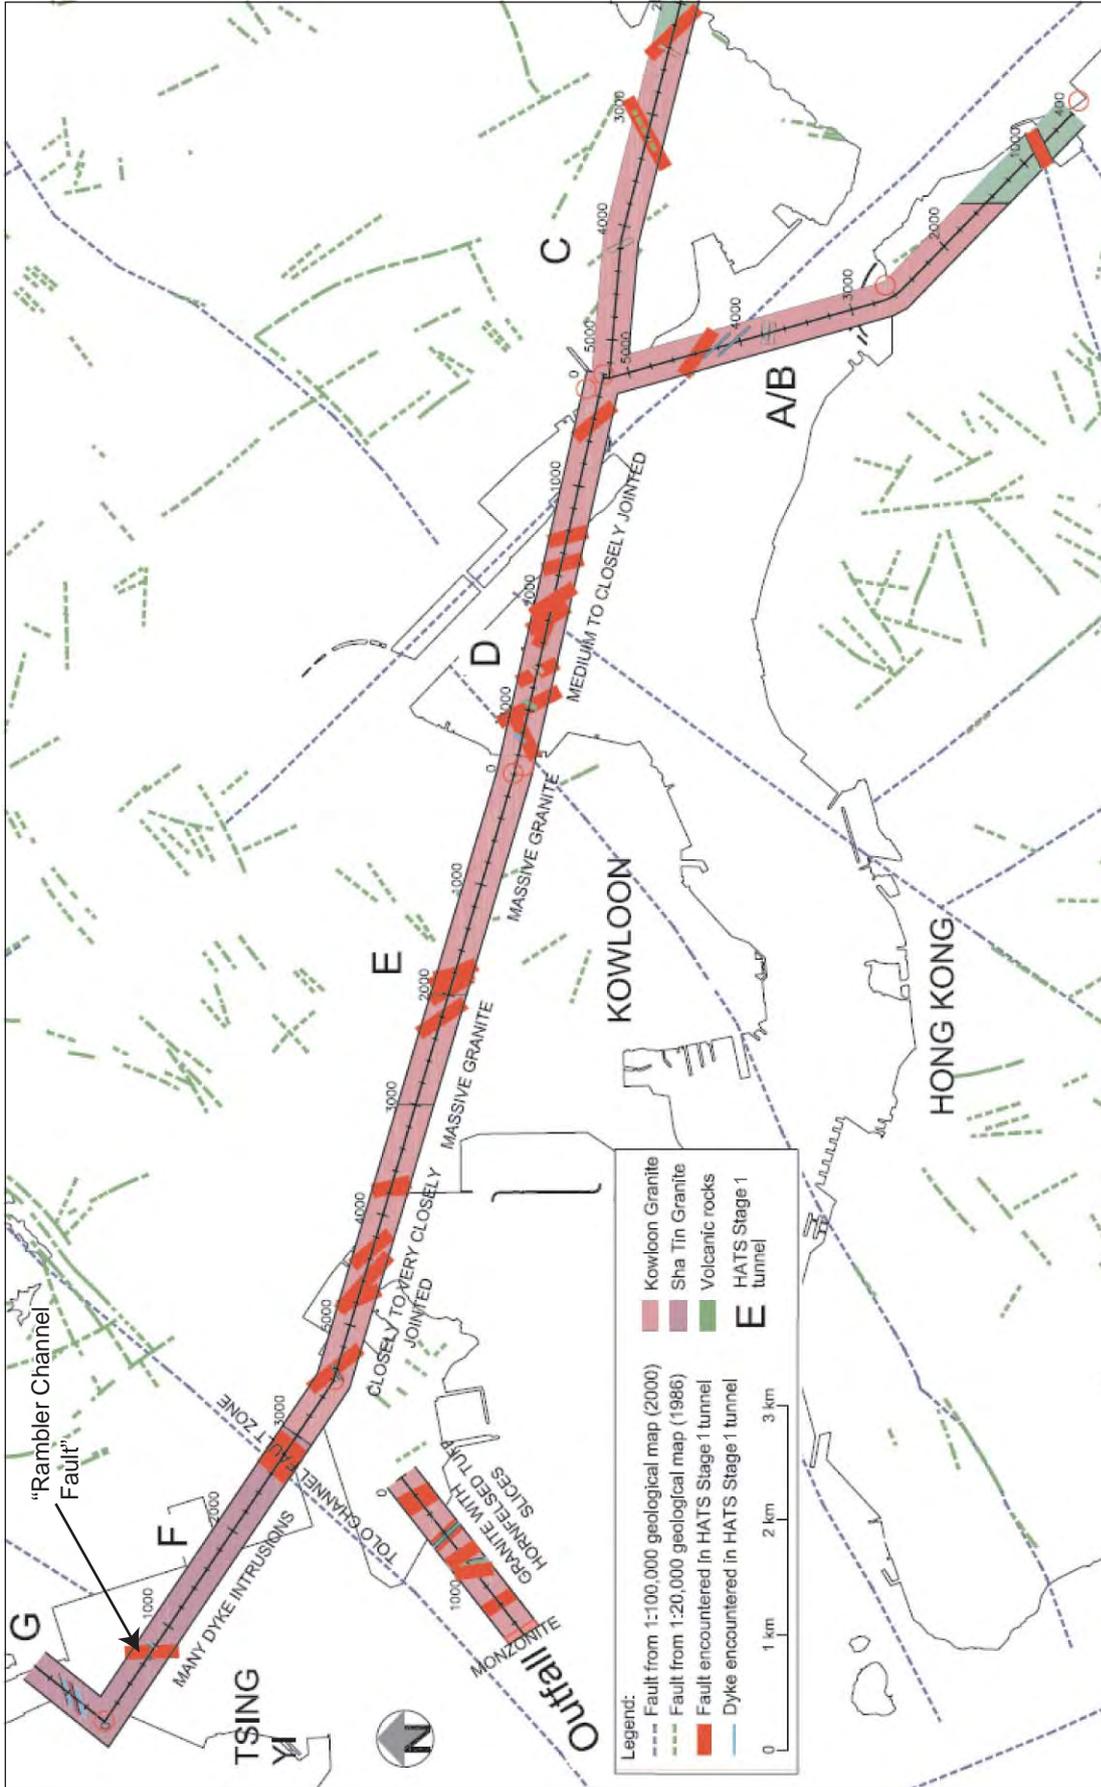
Schematic plan of adverse geological structures encountered in HATS Stage 1 tunnels West of Tseung Kwan O (from as-built records) and faults and photolineaments from the 1:20,000-scale (GCO, 1986b) and 1:100,000-scale (Sewell et al., 2000) published geological maps
